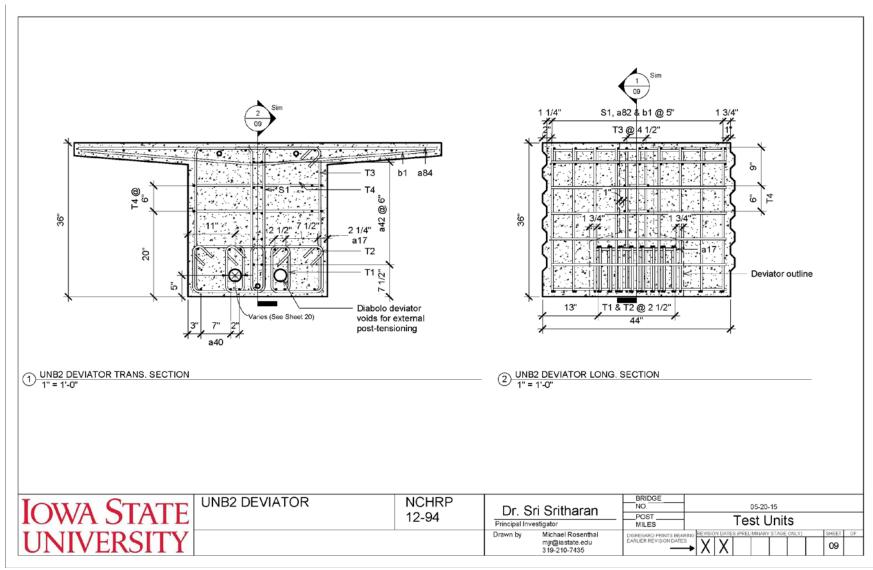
UNB2 Deviator Segment Longitudinal and Transverse Section
